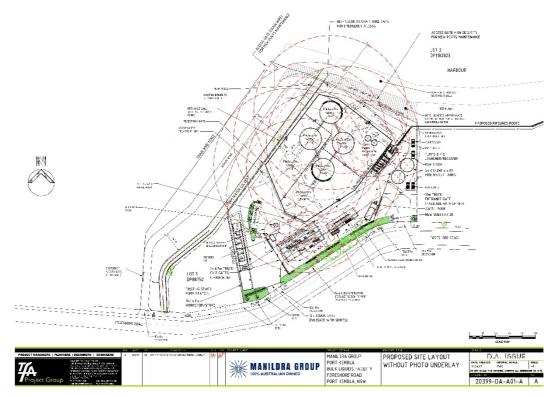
Proposed site layout (excerpt from TfA drg no. 20399-DA-AO1-A)
